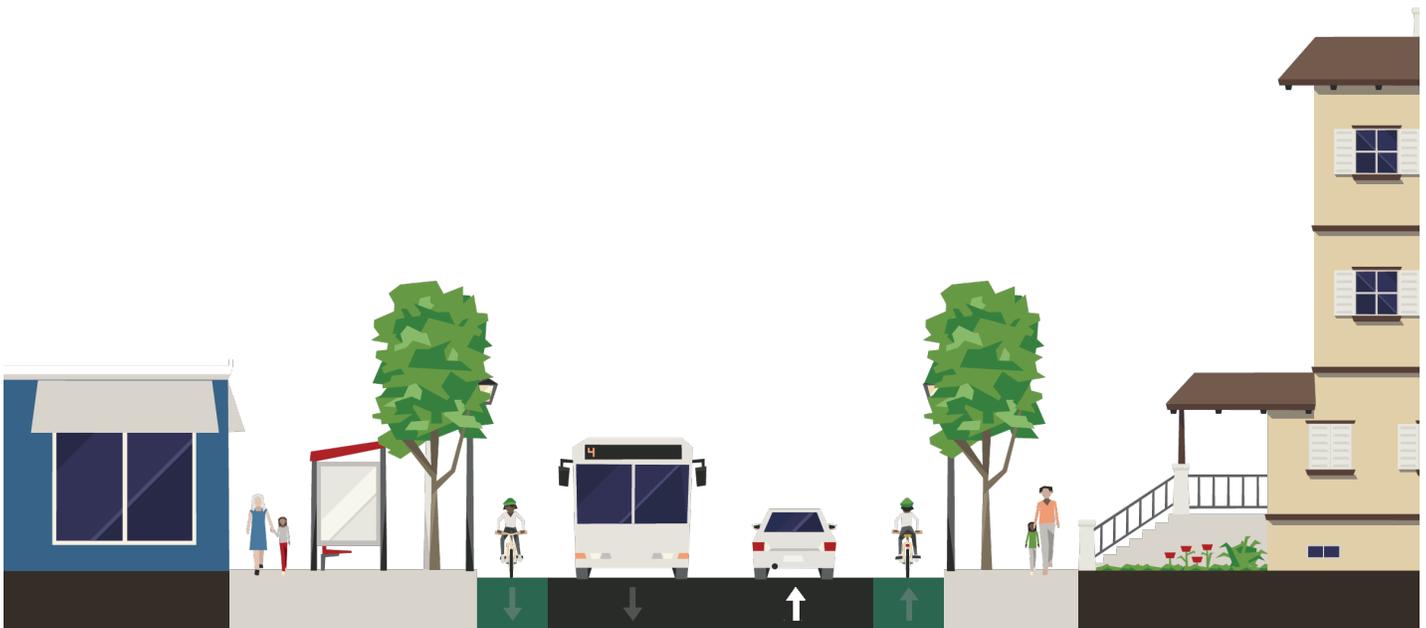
Example of “Complete Streets” elements (Streetmix.net)
